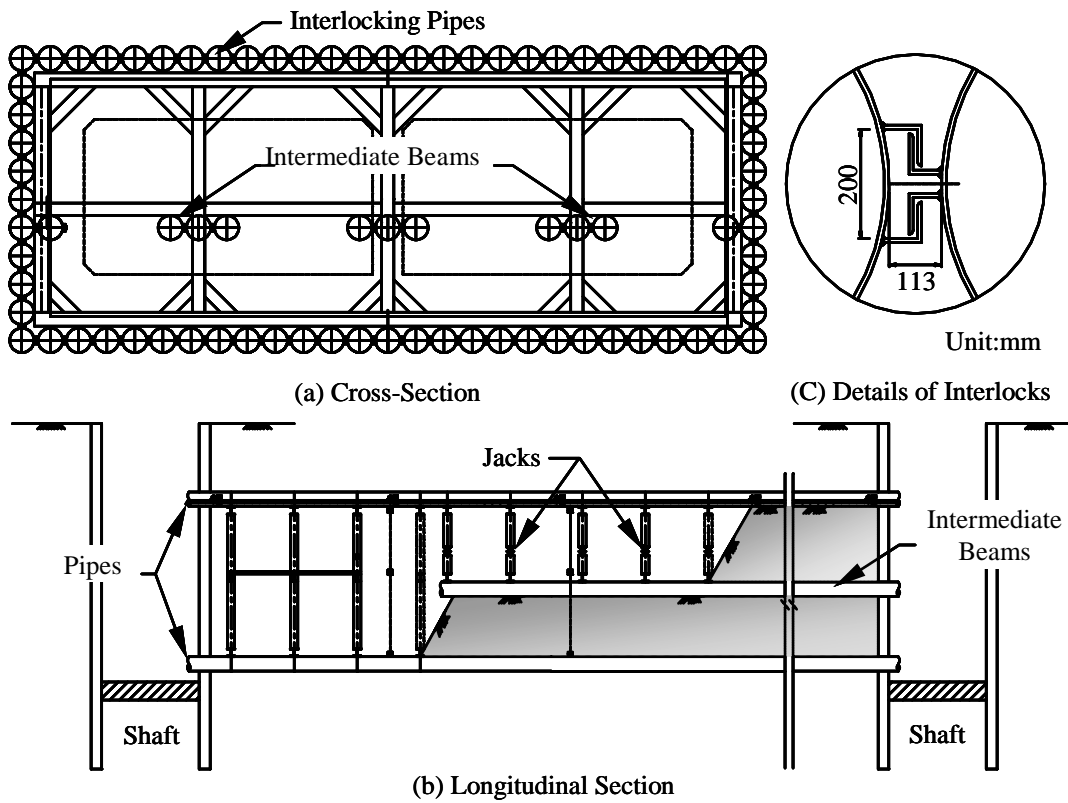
Tunneling in sections 3 and 4 of the Underpass
